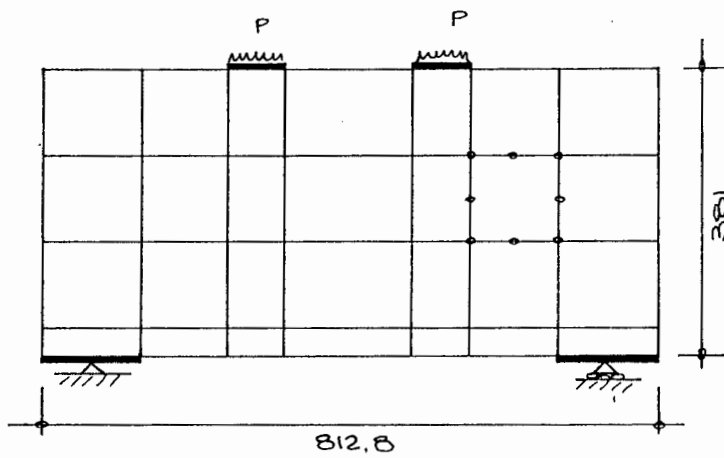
Deep Beam: Finite Element Model No.3
